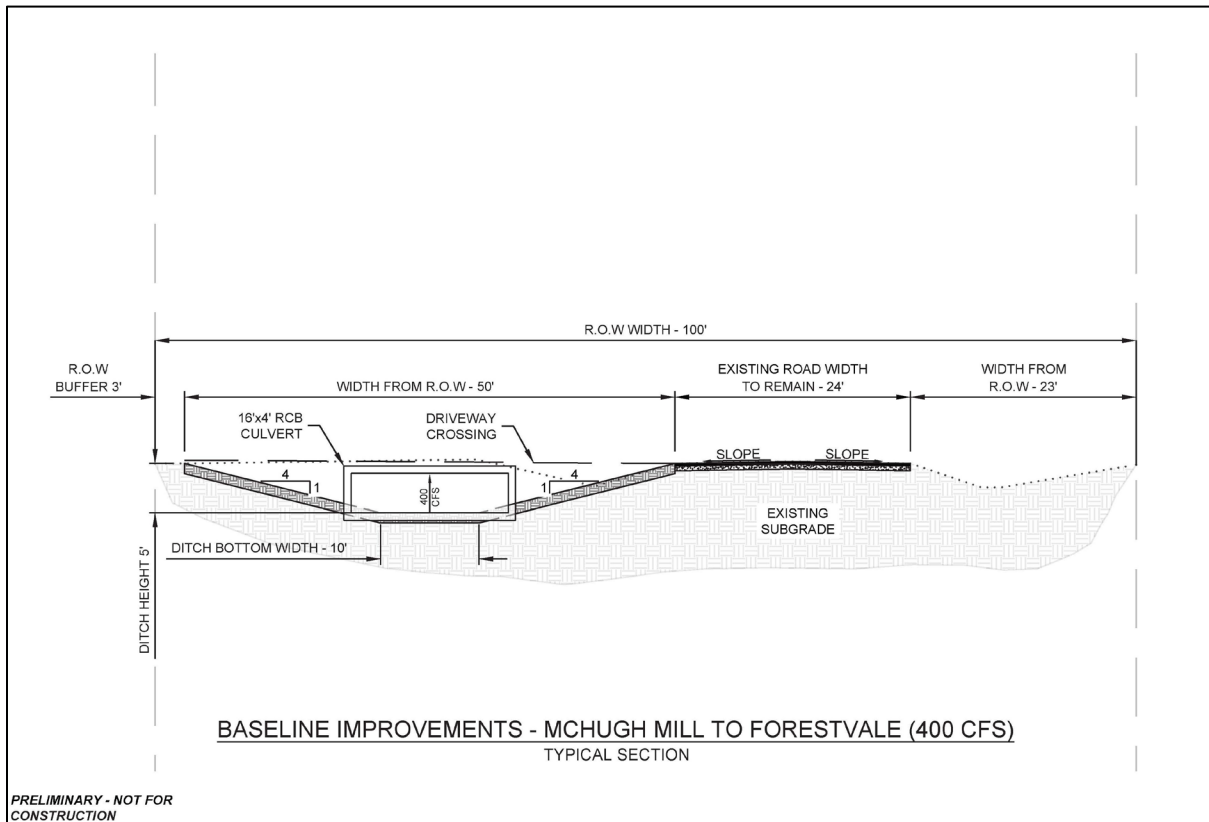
Typical section for the roadside ditch and RCB culvert layout along McHugh Lane between Mill Road and Forestvale Road.
